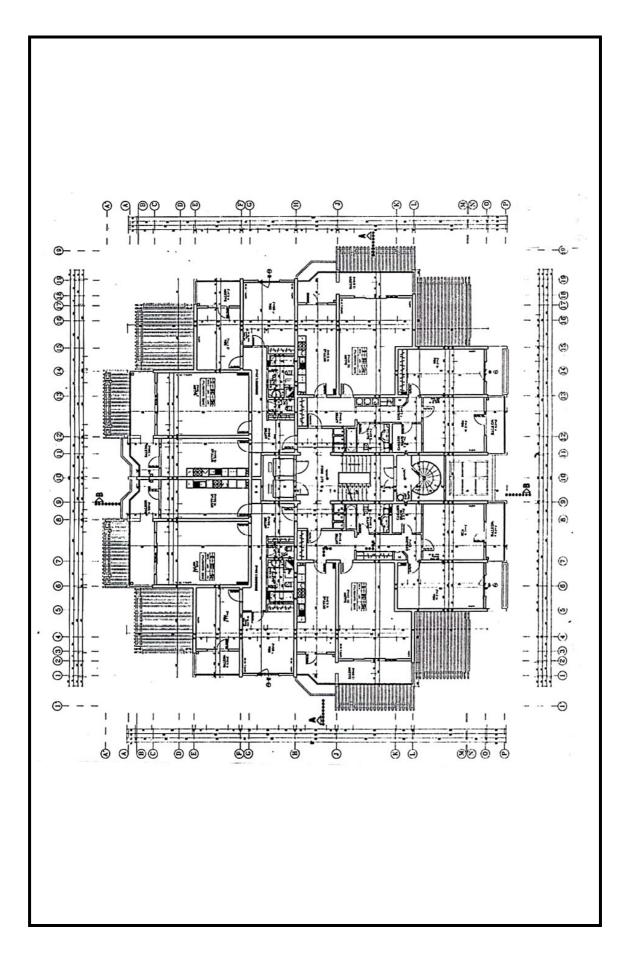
Mavişehir II; Flamingo 16th -17th Floor Plan
